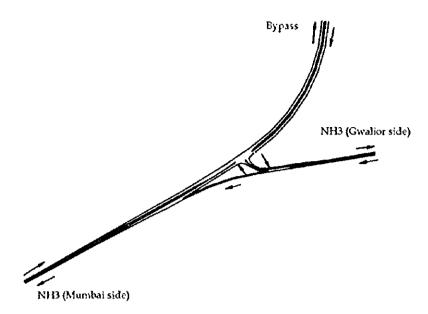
Layout of the Intersection at the End of Point of Gwalior Bypass
